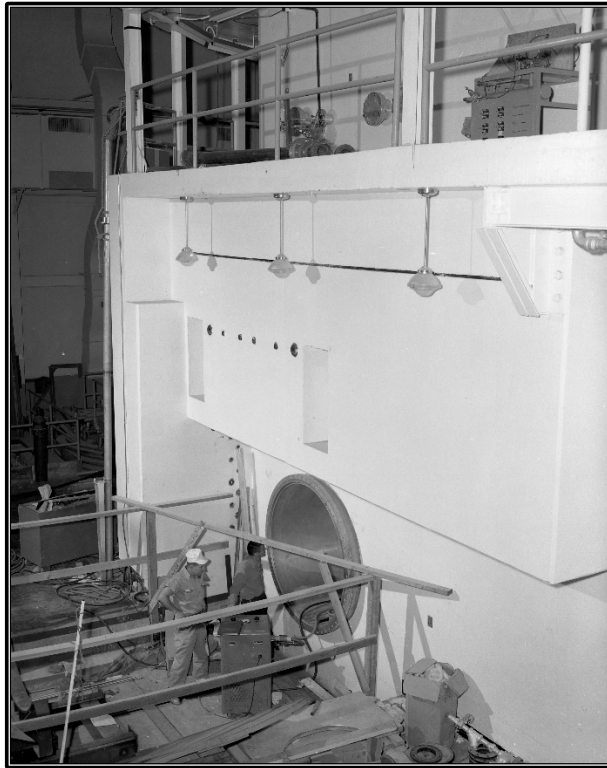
Archival photograph showing one of the ORR Engineering Test Facilities nearing completion at Building 3042, circa 1957 (ORNL Photo 42190).
